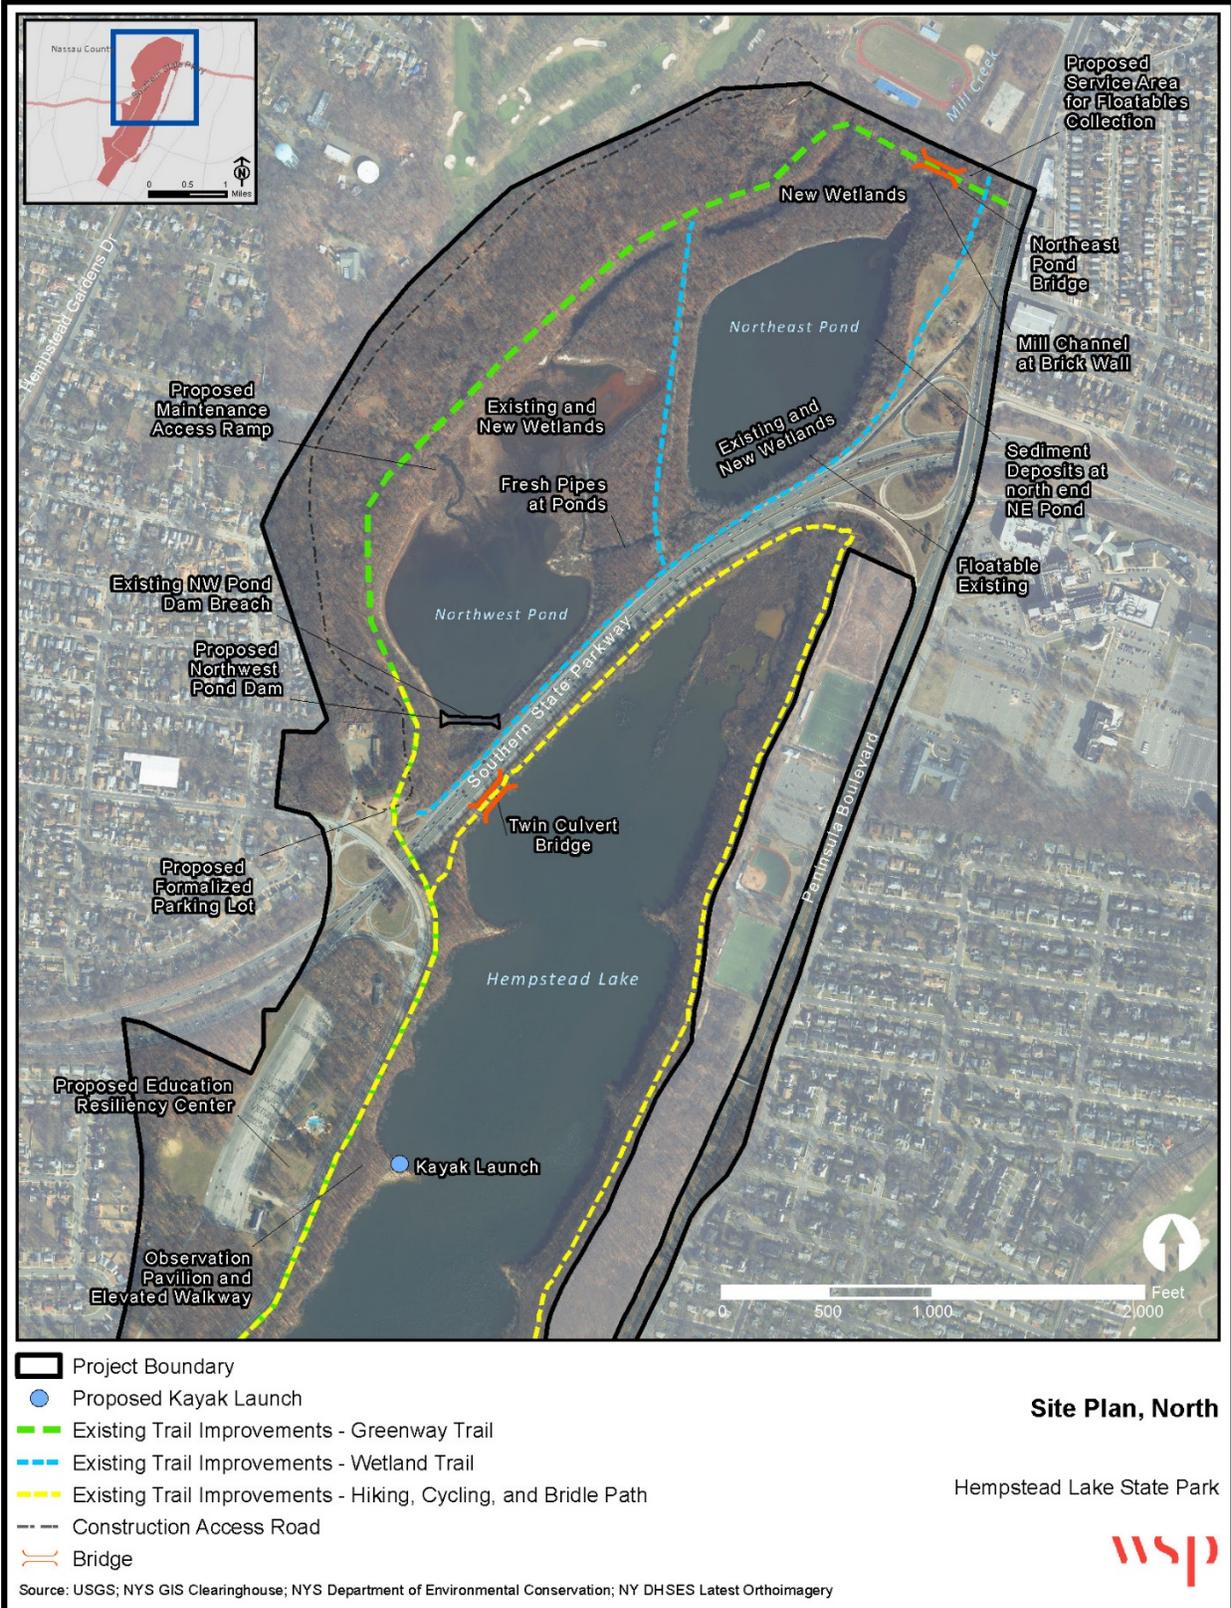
Hempstead Lake State Park Project - Site Plan, North
